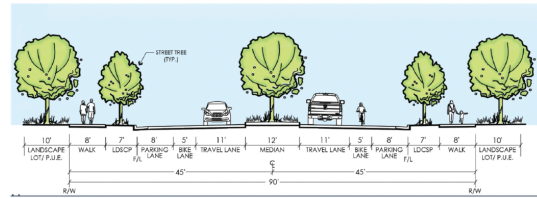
E. REDWOOD ROAD (EAST OF MOFFETT ROAD)
